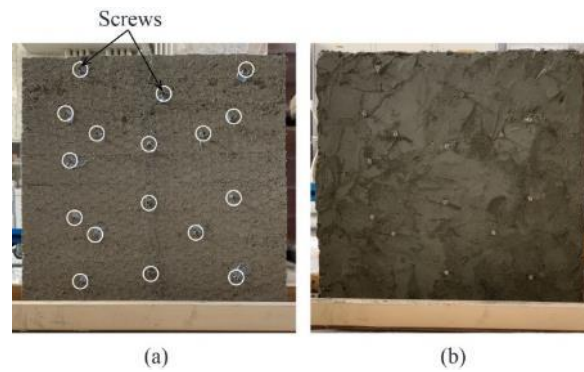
Strengthening details: (a) Fixation of mesh and screws; (b) Final view after plastering specimen
